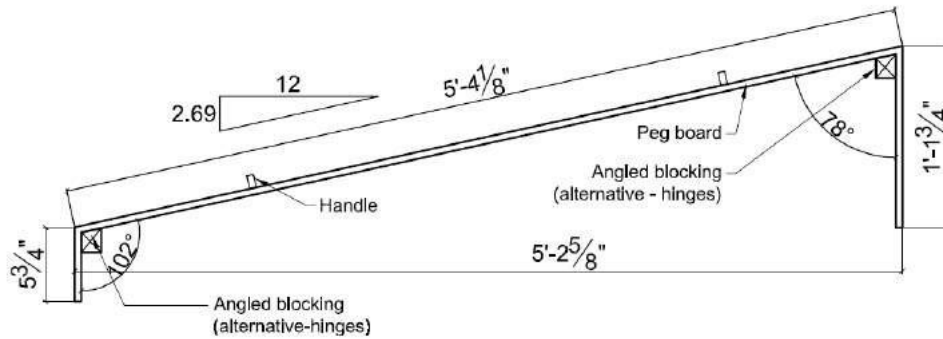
through Figure B-19 show construction details for fabrication of the dense-packing mold used to install insulation at the eave end and the middle section (Mold-A).
